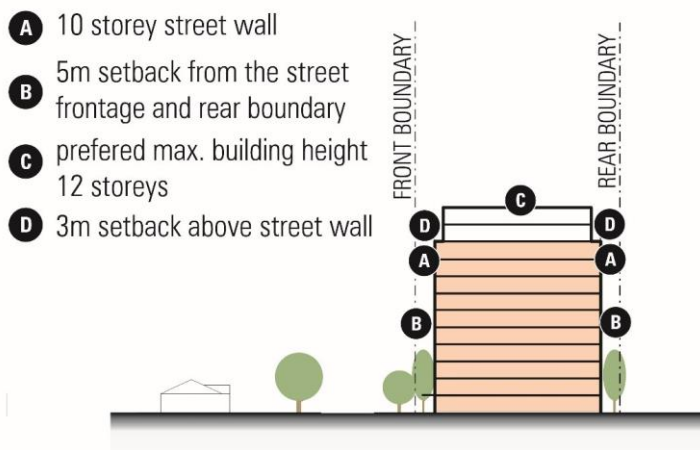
Sub-precinct F7 Illustrative Cross-Section
